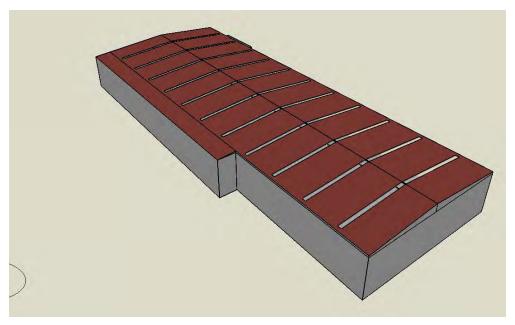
Design Builder model showing the proposed skylights on the industrial building to achieve daylight access requirements
